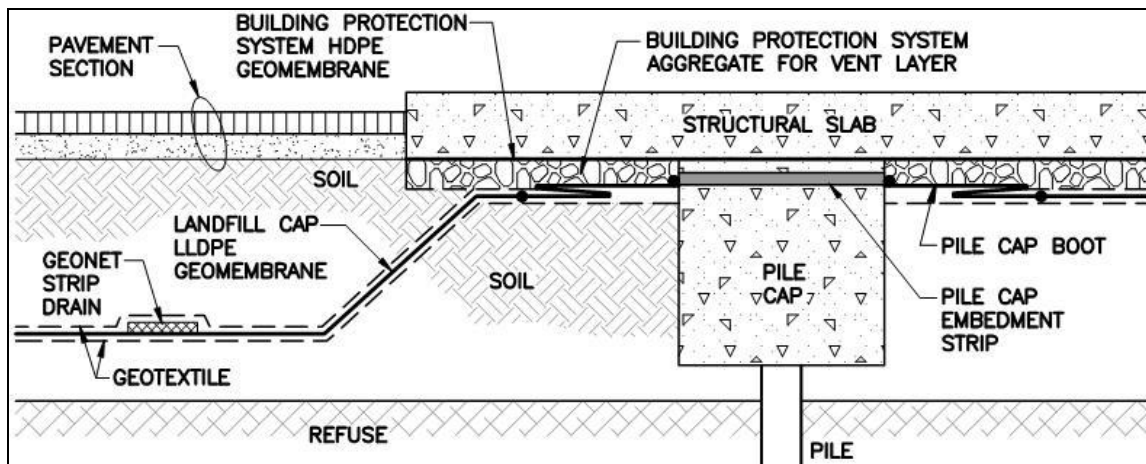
Boot-Ring settlement compensation system for a landfill cap under pile-supported structures
